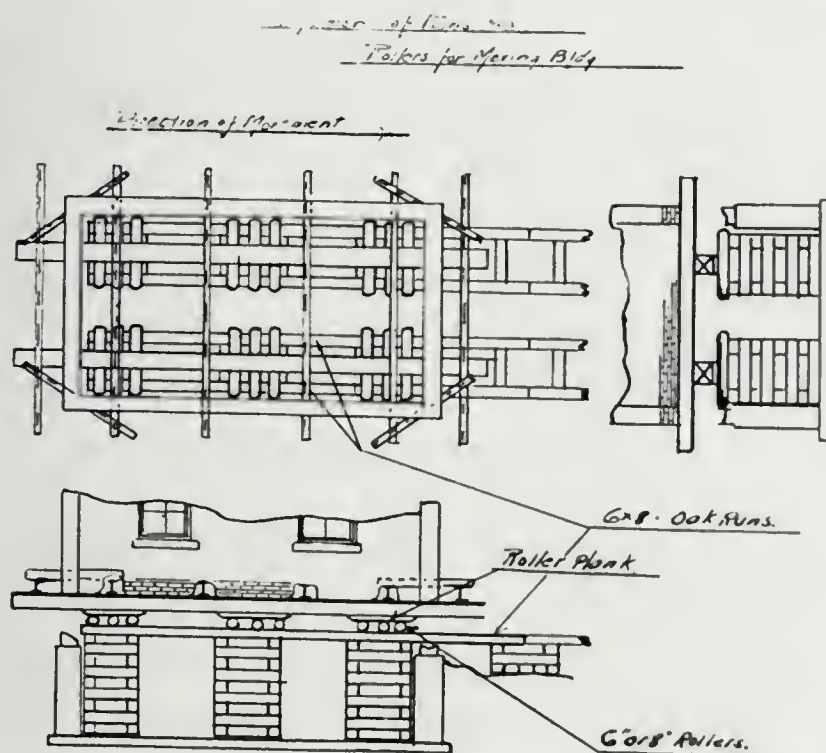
Arrangement of Runs and Rollers for Moving a Building.
